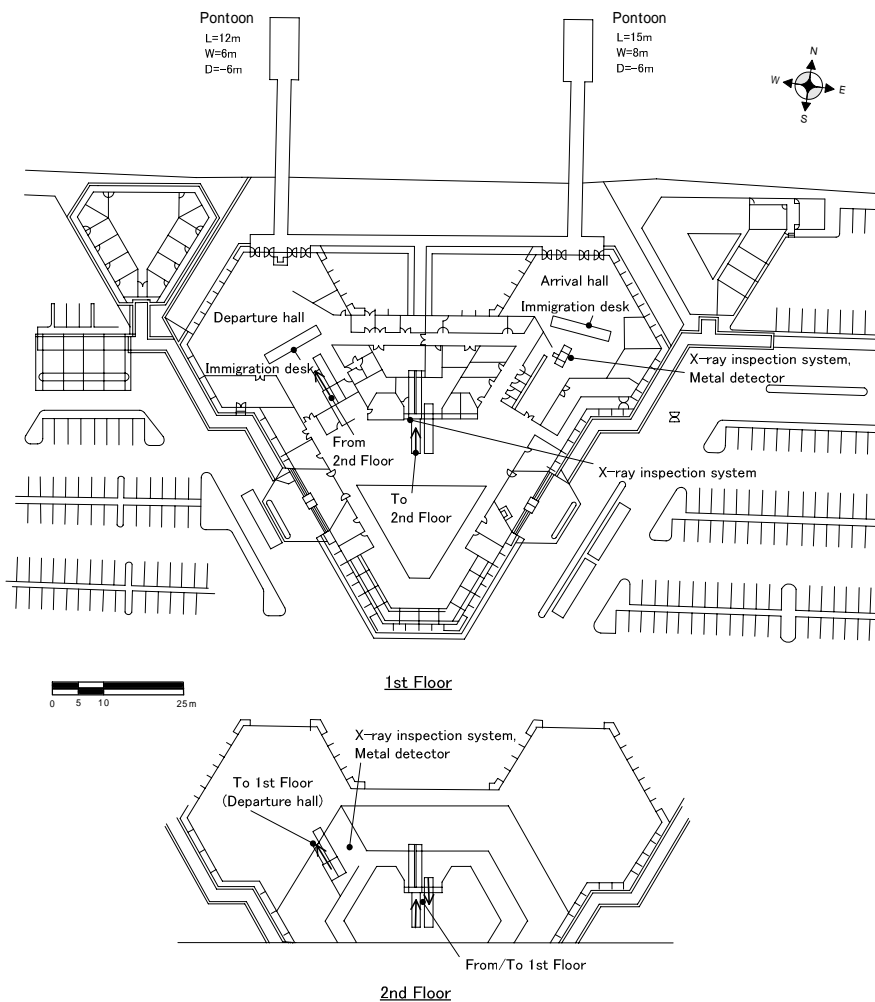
Layout Plan (Passenger Terminal)
